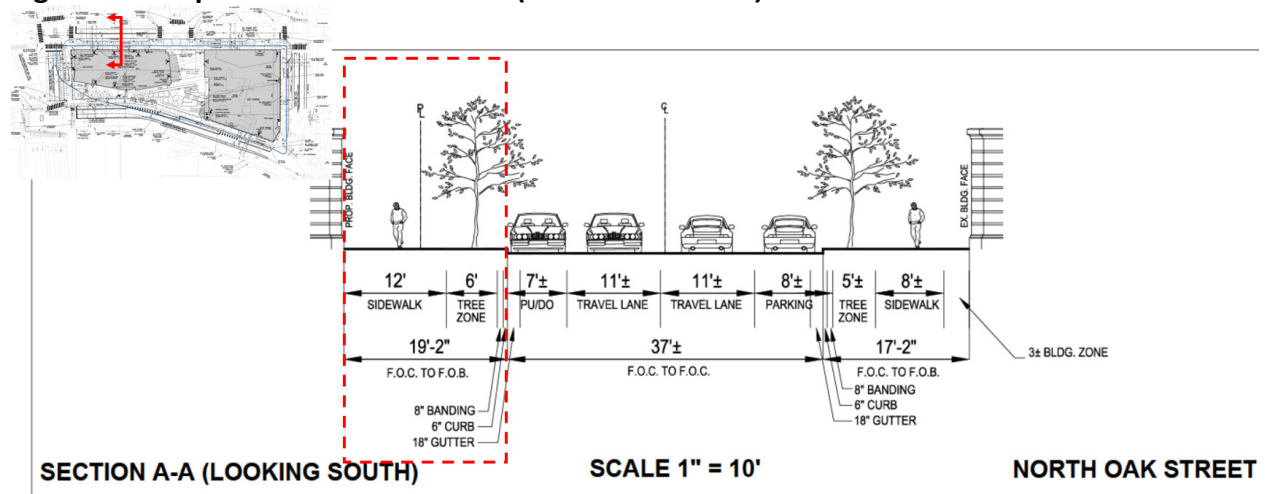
Proposed North Oak Street (Northern Portion) Cross-section.
